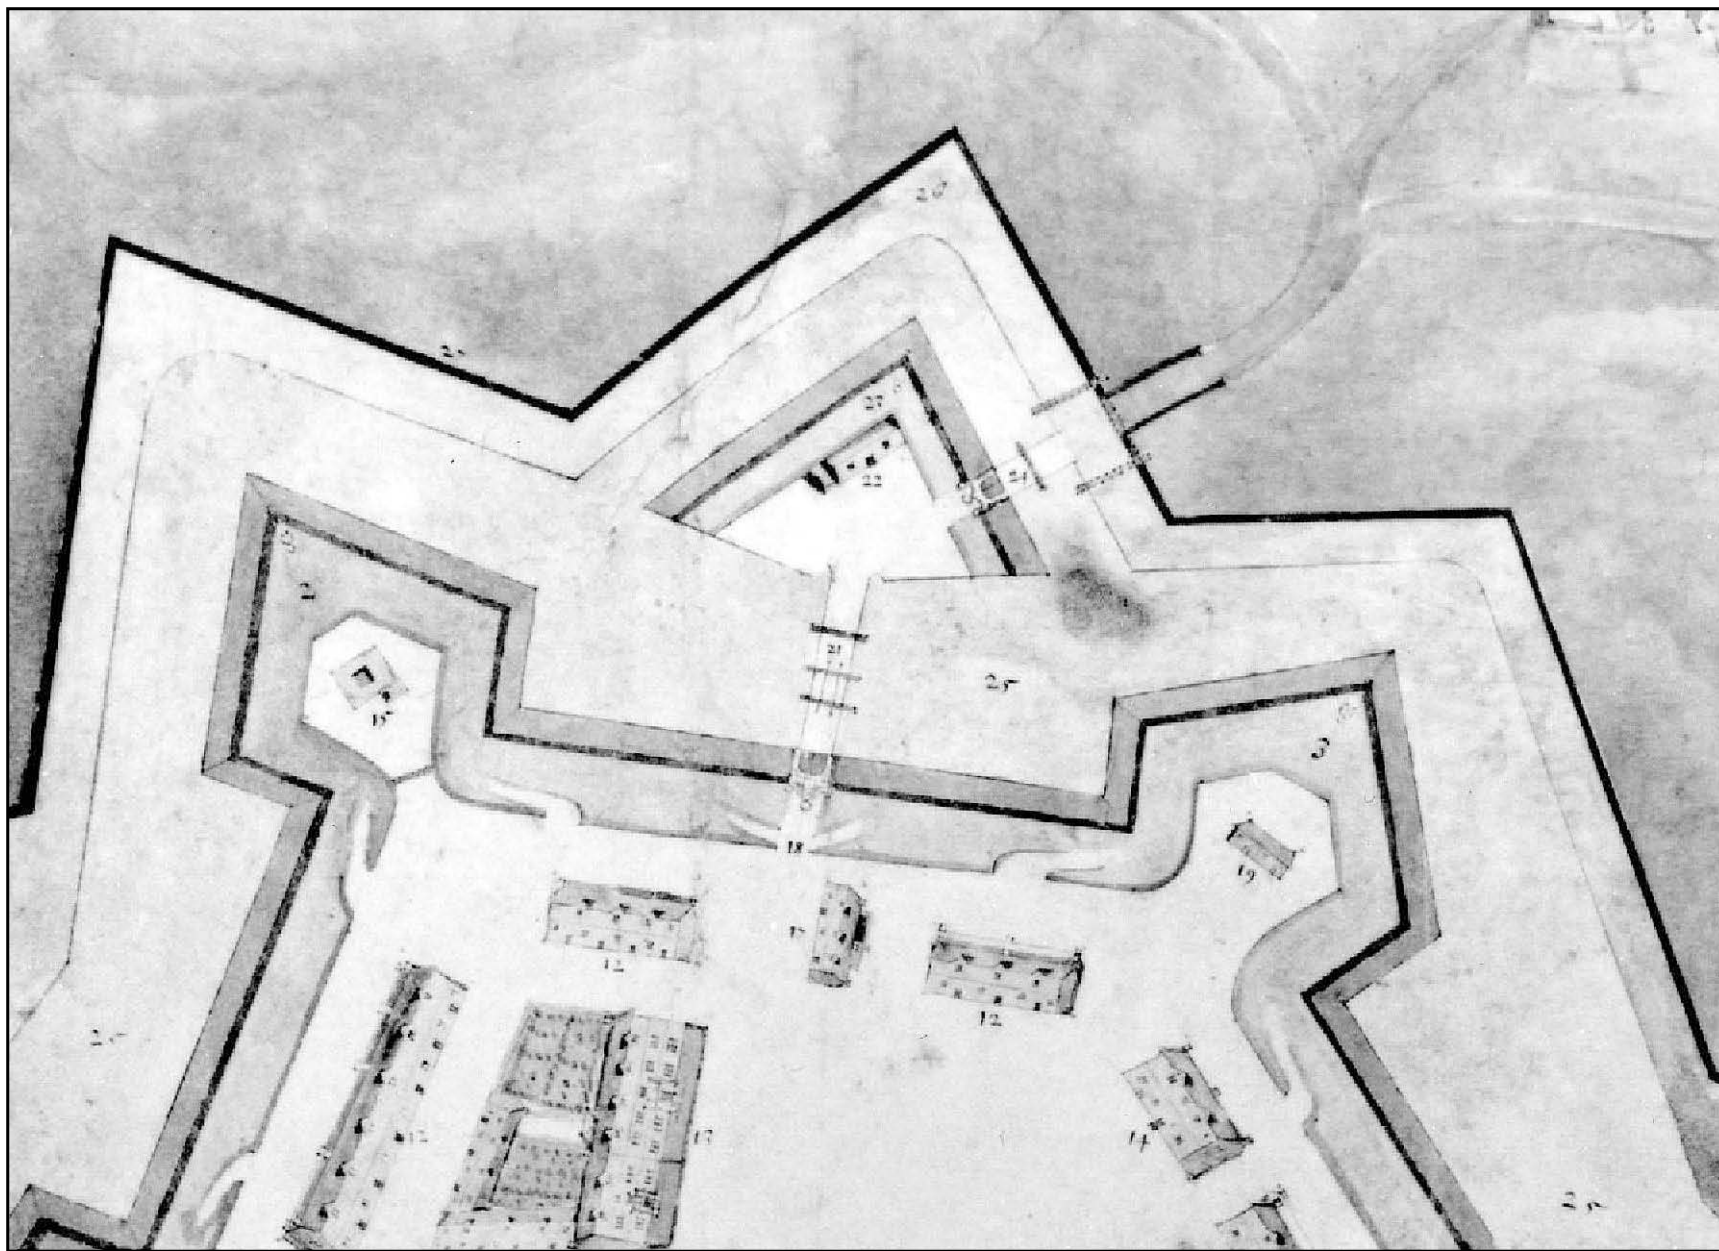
Detail of the 1677 plan of the Royal Citadel showing the north ravelin.
